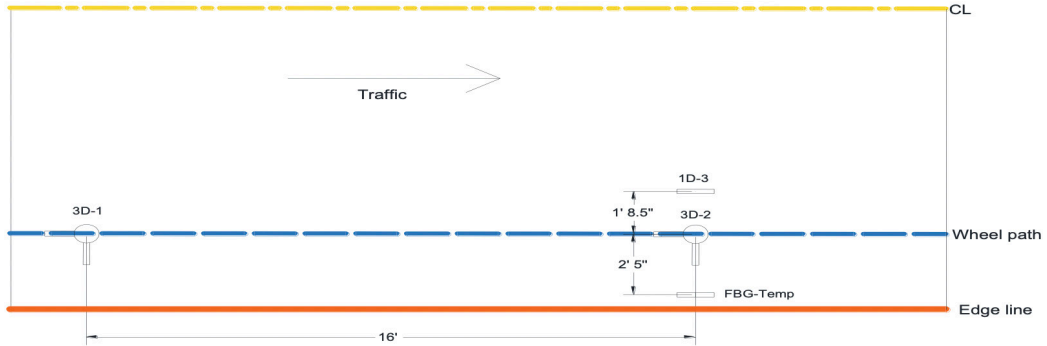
Sensors Layout (3D: Three Dimensions, 1D: One Dimension, CL: Center Line, 1': foot, 1'': inch)
